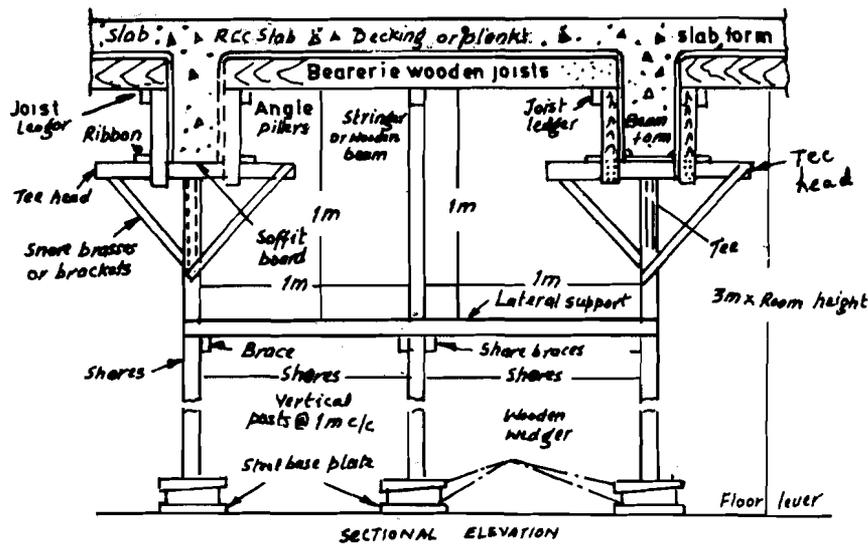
Wooden Formwork for Monolithic R.C.C. Beam and Slab Floor
